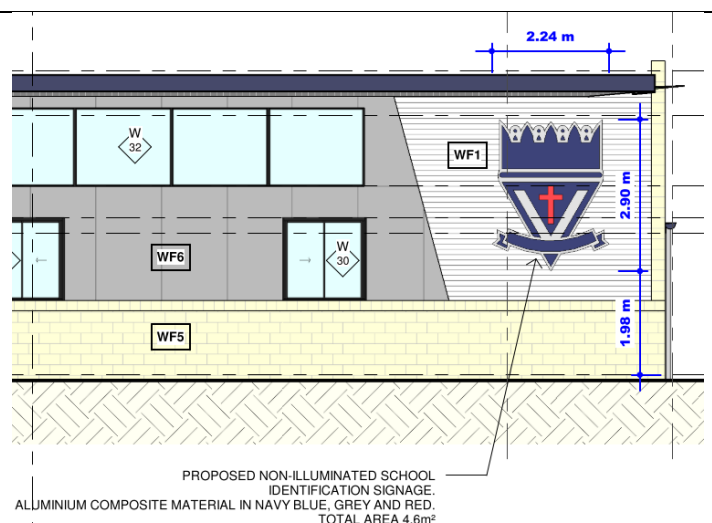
Proposed school main building sign (Source decision plans south elevation drawing)
